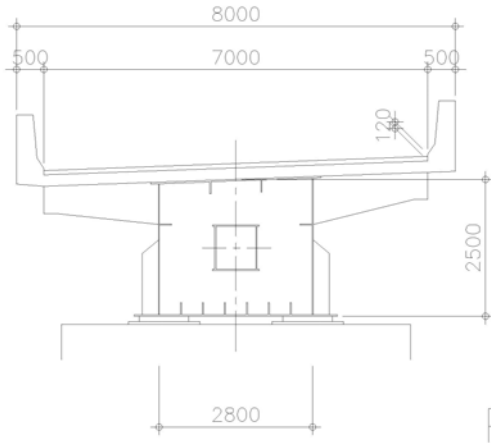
Typical Cross Section of Ramp Bridge (1-Lane)
